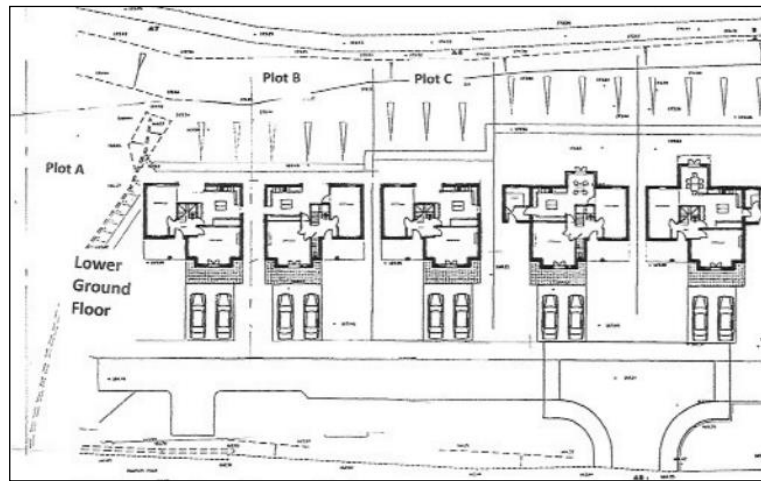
Illustrative Site Layout (also showing the two existing plots erected adjacent to the development site)
